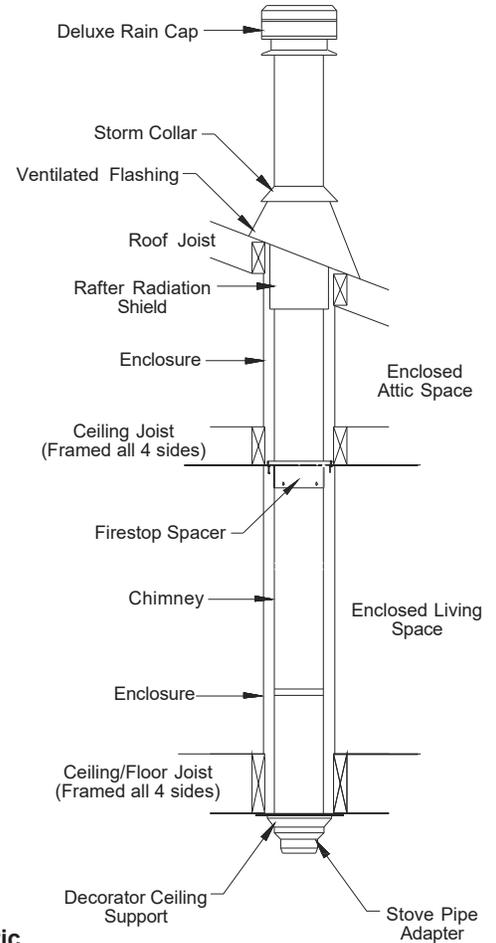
Enclosed attic space with Firestop Spacer and Rafter Radiation Shield
